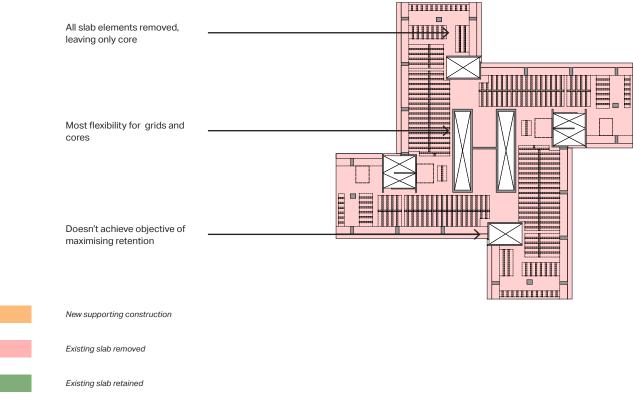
Structural overlay showing the extent of the structure retained with centralised expanded core layout
